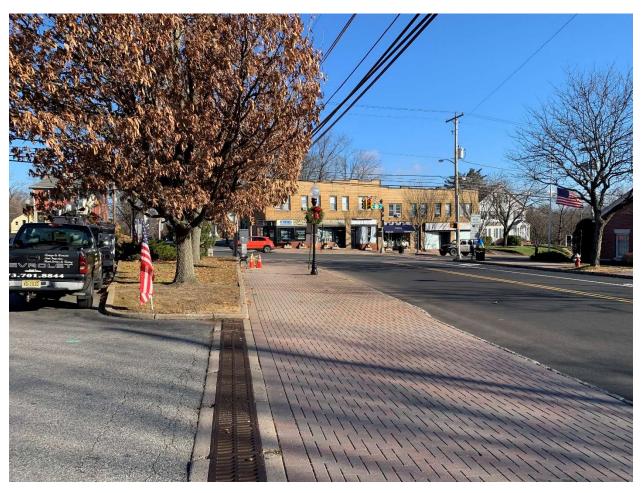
Photo along the eastern property line from the existing driveway on Hillside Avenue facing north.
